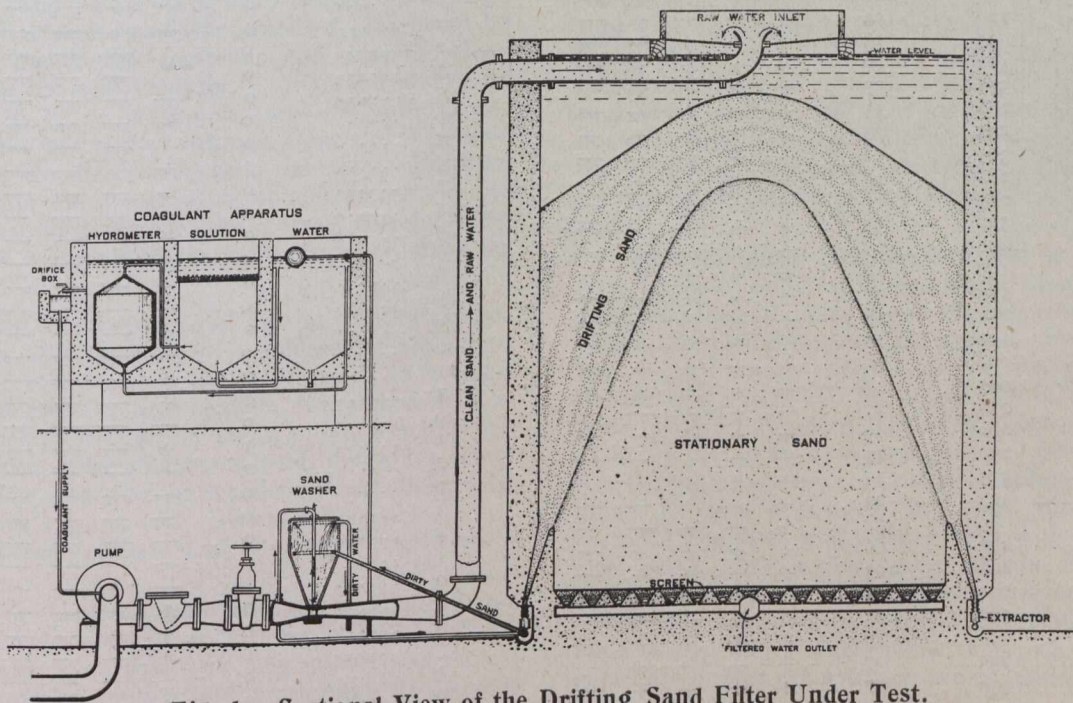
Sectional View of the Drifting Sand Filter Under Test.
